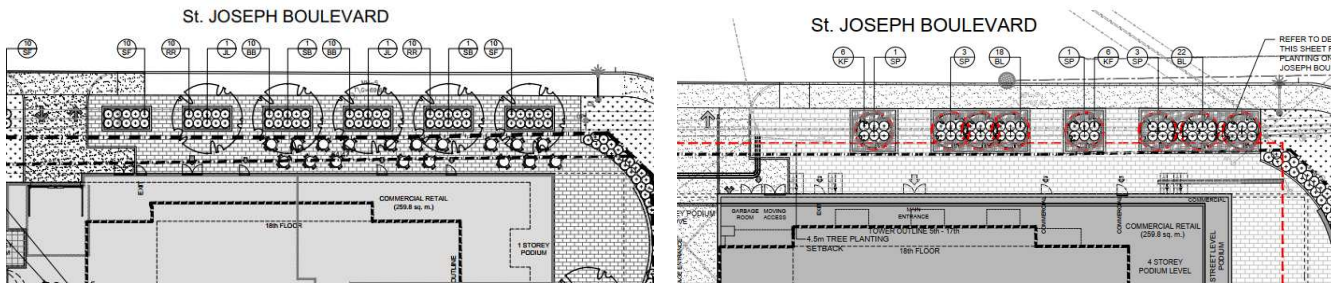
Landscape Plan from Submission 1 (left) and Submission 2 (right), comparing the at-grade planters on St. Joseph Boulevard
